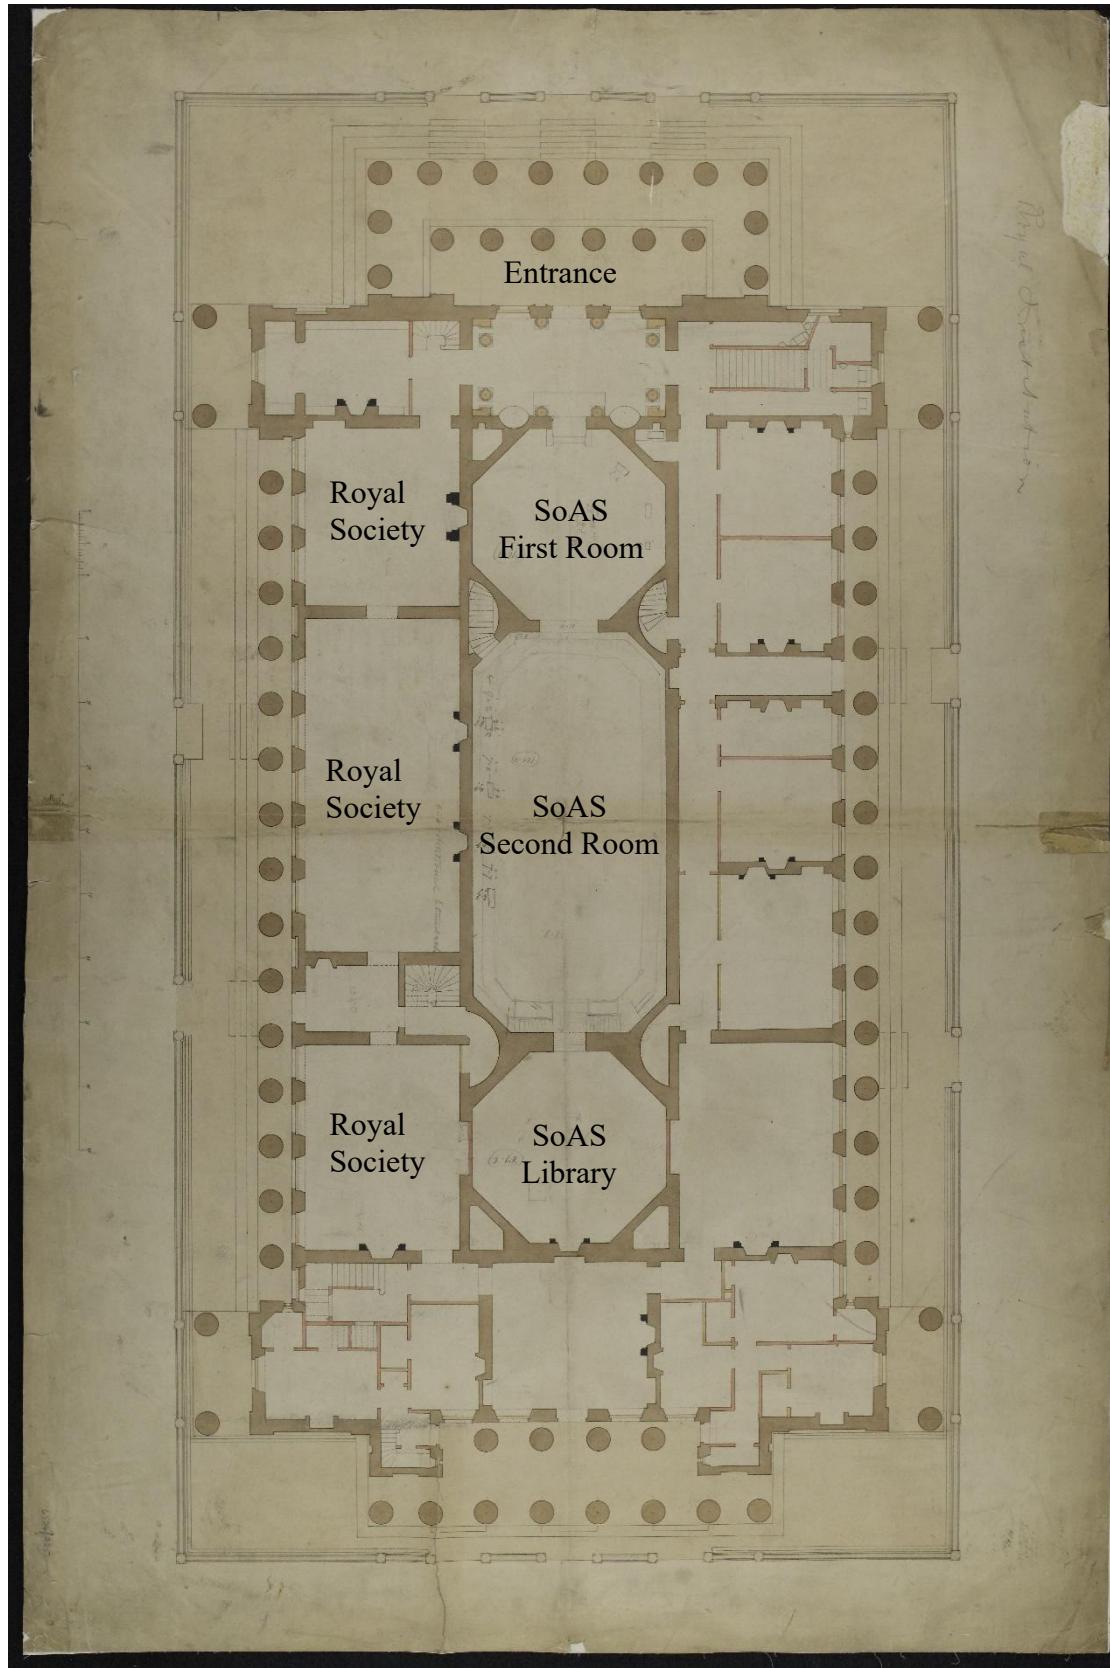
Plan of Royal Institution Buildings, n.d., NRS, RHP6504/225.
